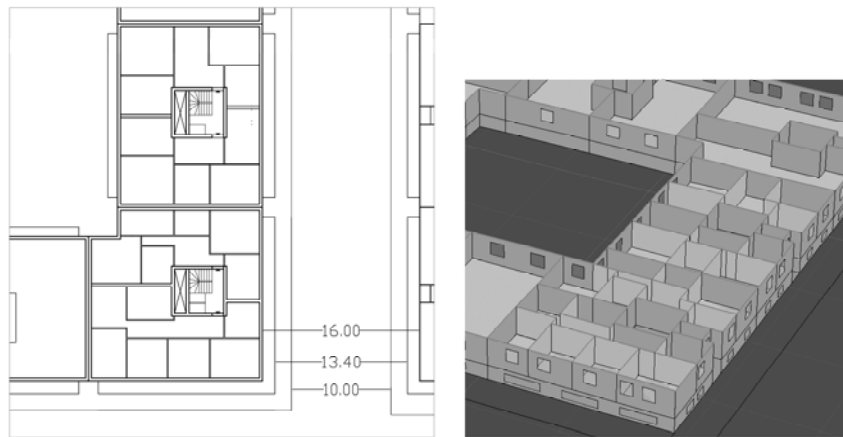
Layout plan and 3D cut away section of the examined buildings of Type II.
